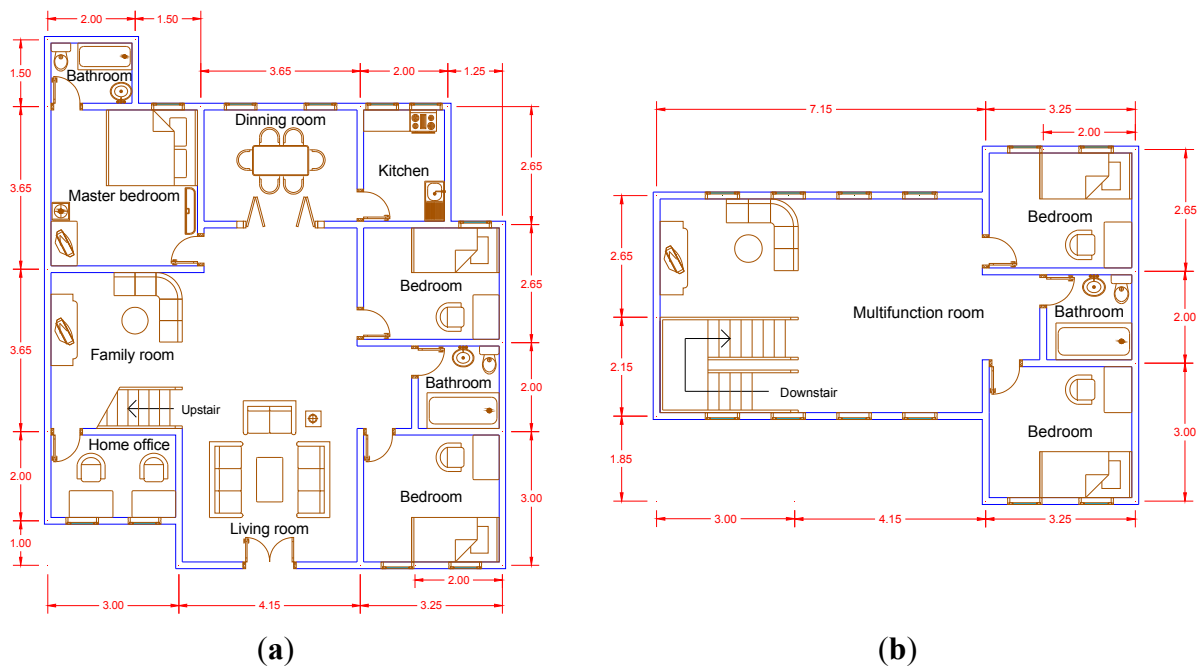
Floor plans of the main simulation target (not to scale) (unit: m). (a) First floor plans; (b) second floor plans
